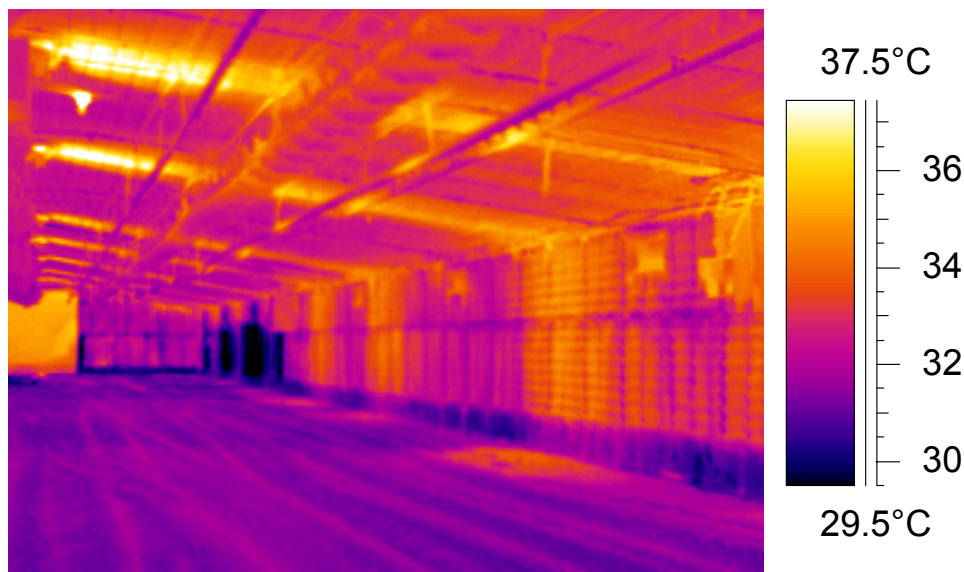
Example thermograph of east sidewall and ceiling (June 2006).
